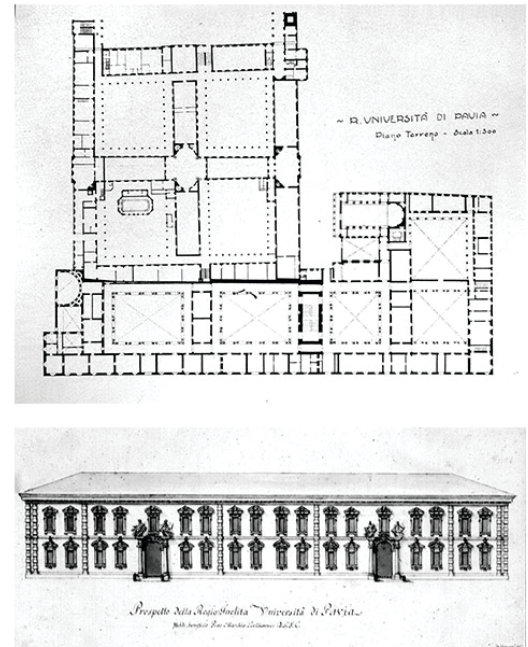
Front and floor plan of the 1945 historic building complex in the centre of Pavia. Below, design proposal of the front on Strada Nuova never realised (Archive of the Pavia Civic Museums, in doi.org/10.3280/oa-548.142).
